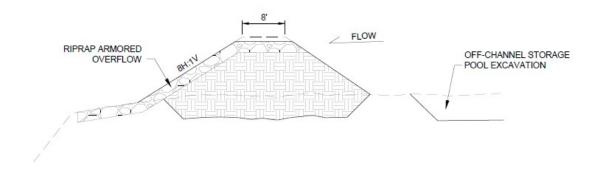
Typical Dam Diversion Extension and Off-Channel Storage Section
